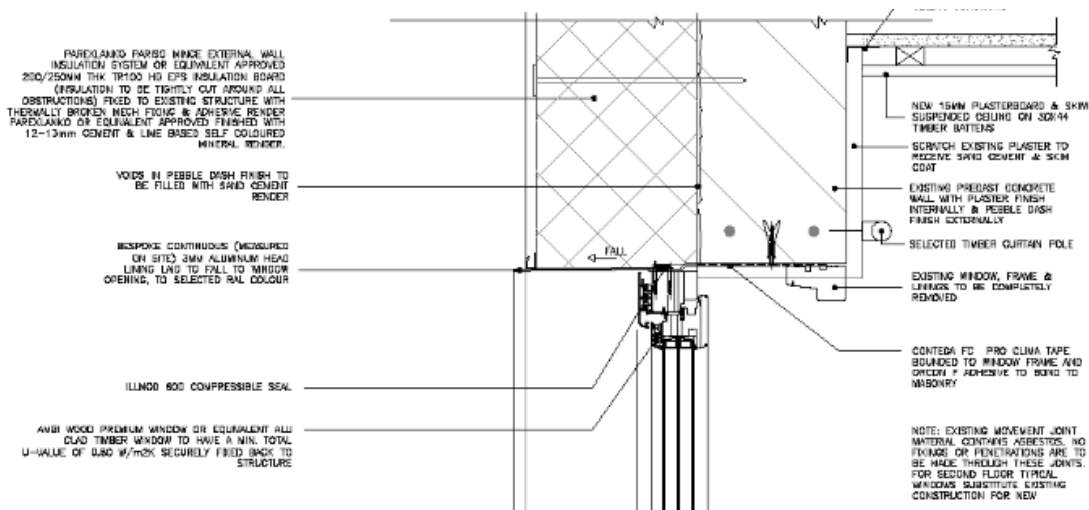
Head window detail on the existing building(not to scale)[DRL Co.Co,2014].
